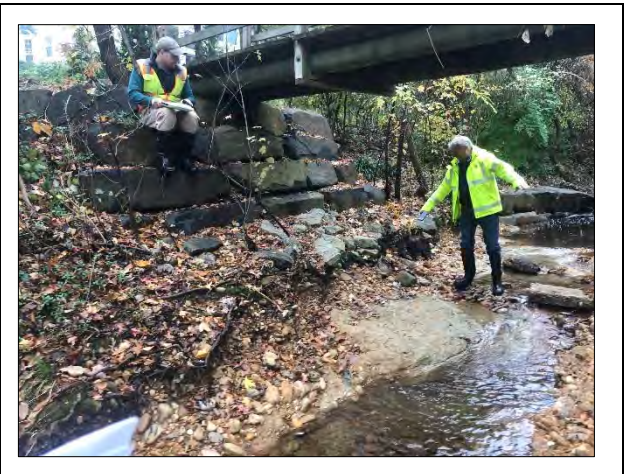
Right Bridge Abutment – Looking Upstream (November 2021, Station 5+00)
